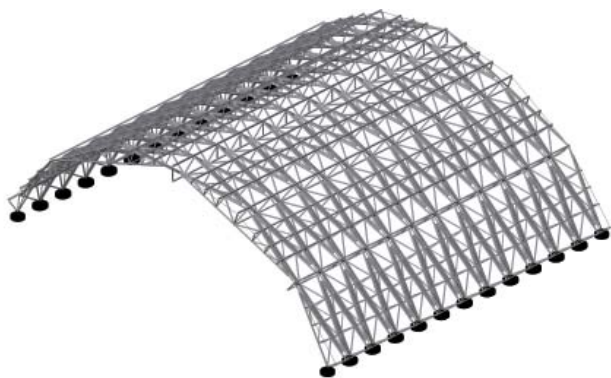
Isometric view of cylindrical folded construction made of wooden trusses
